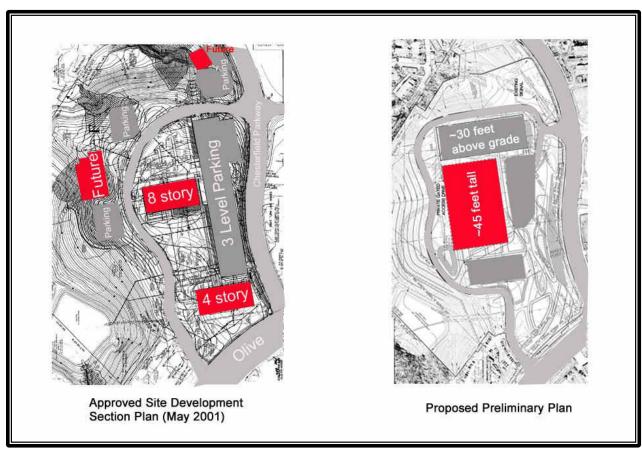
Spatial Comparison of Approved Section Plan and Proposed Preliminary Plan
